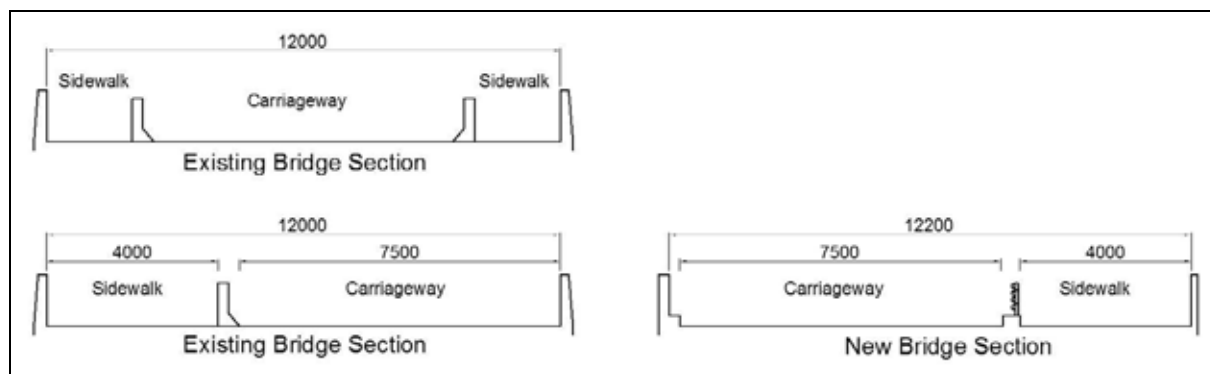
Existing and Planned Cross Section of Johnson Street Bridge
